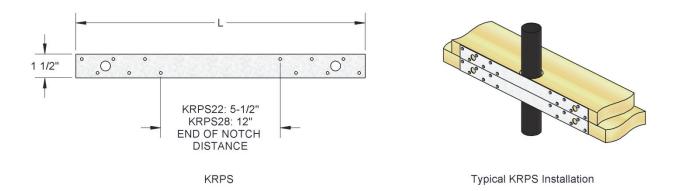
KRPS STRAP TIE AND TYPICAL INSTALLATION DETAIL
